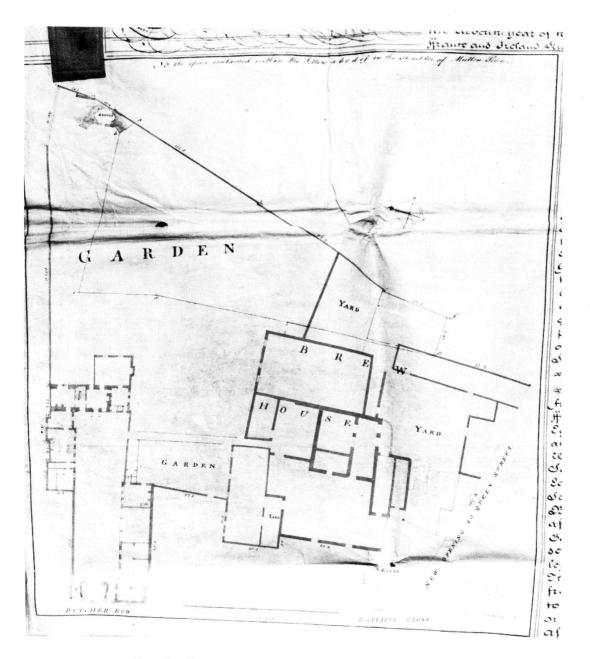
Butcher Row: Plan of house and brewhouse, 1771
